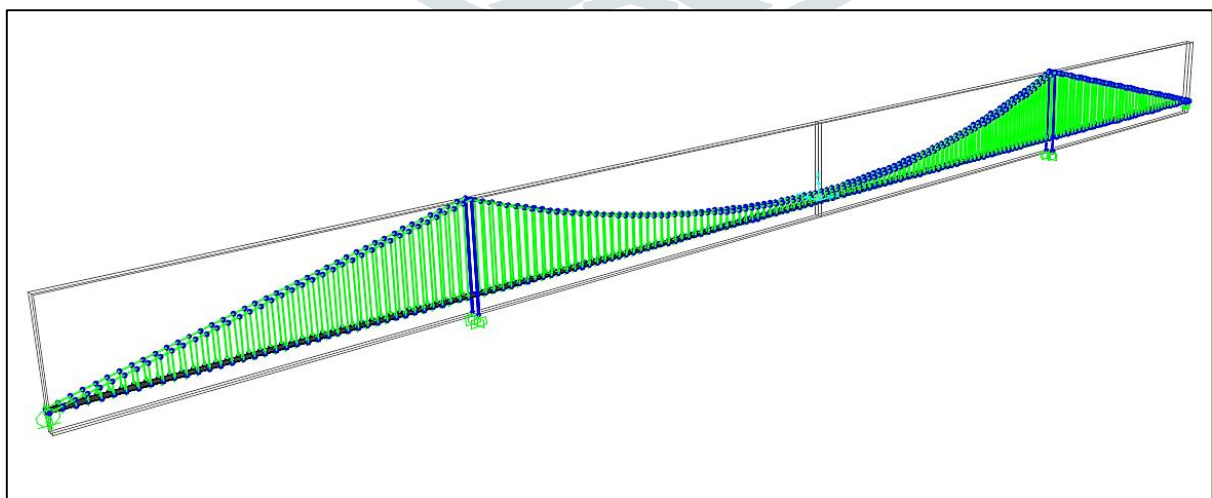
Suspension bridge modeled in CSI-Bridge Software
